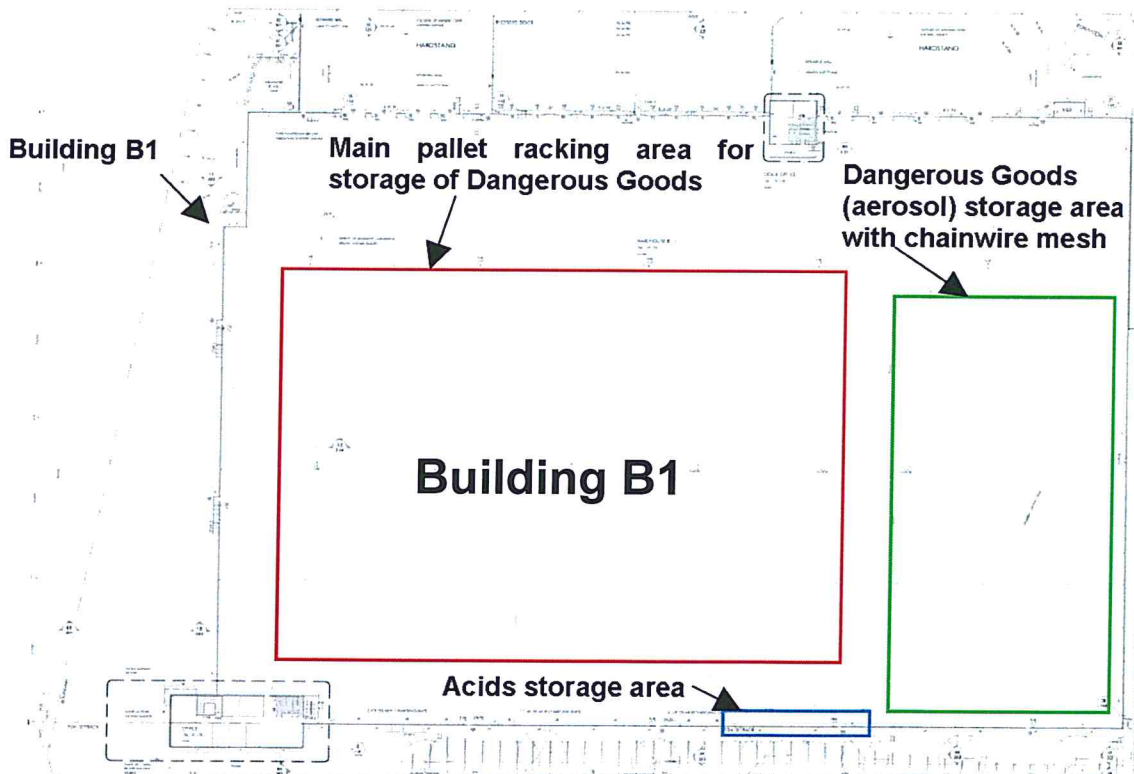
Approved Internal Floor and Storage Plan for Building B1
